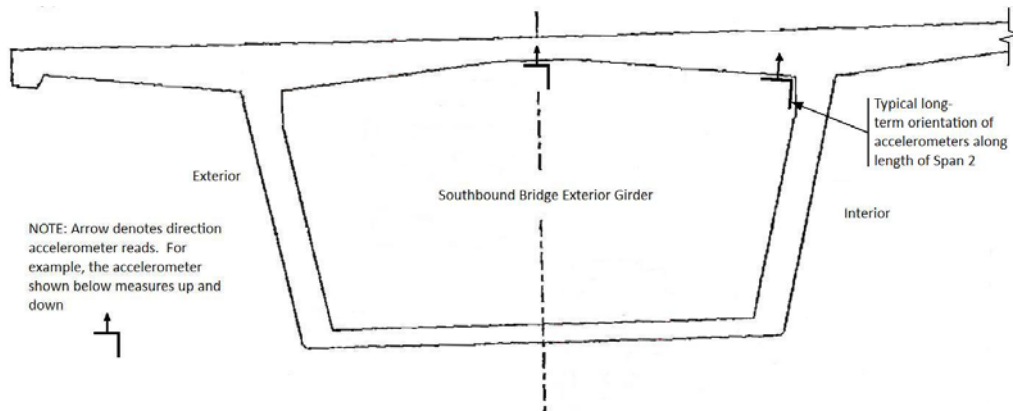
ACCELEROMETER LAYOUT IN THE SOUTHBOUND BRIDGE
